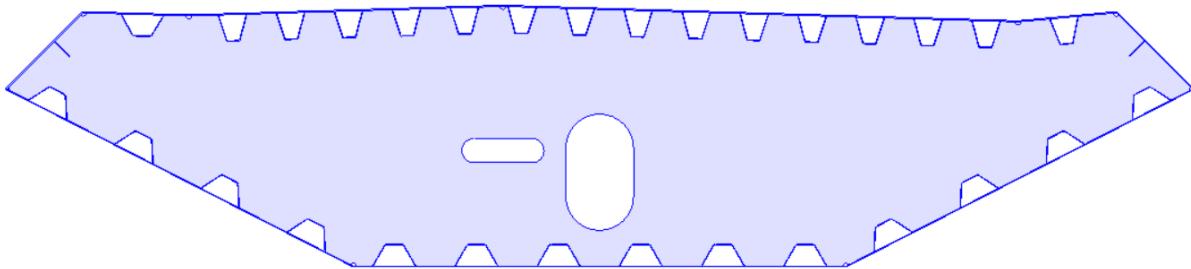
The girder cross-section included with the diaphragm, created in FEM-Design
